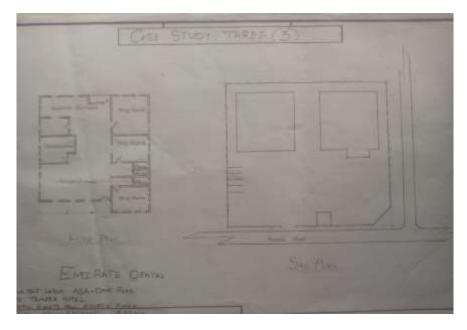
Floor plan and site plan of case study three Emirate Dental Clinic
